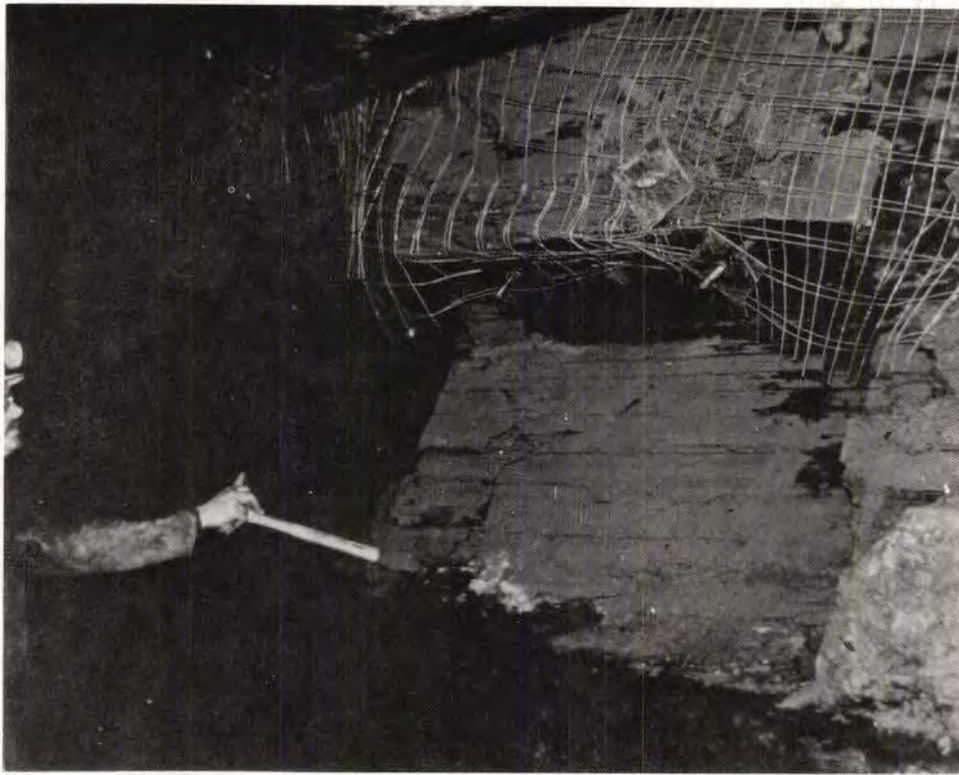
Overbroken tunnel side wall in blocky mudstone
